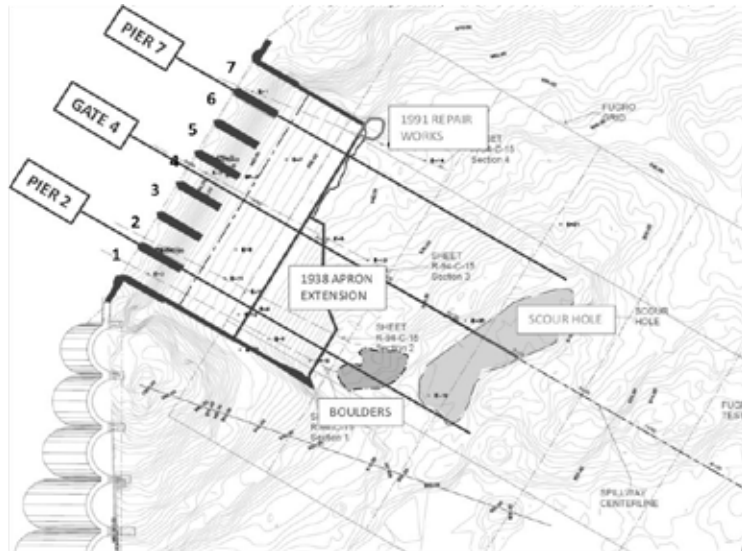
Plan view of 7-gate Spillway, showing the different gates and piers, as well as the original concrete apron and its 1938 extension.
